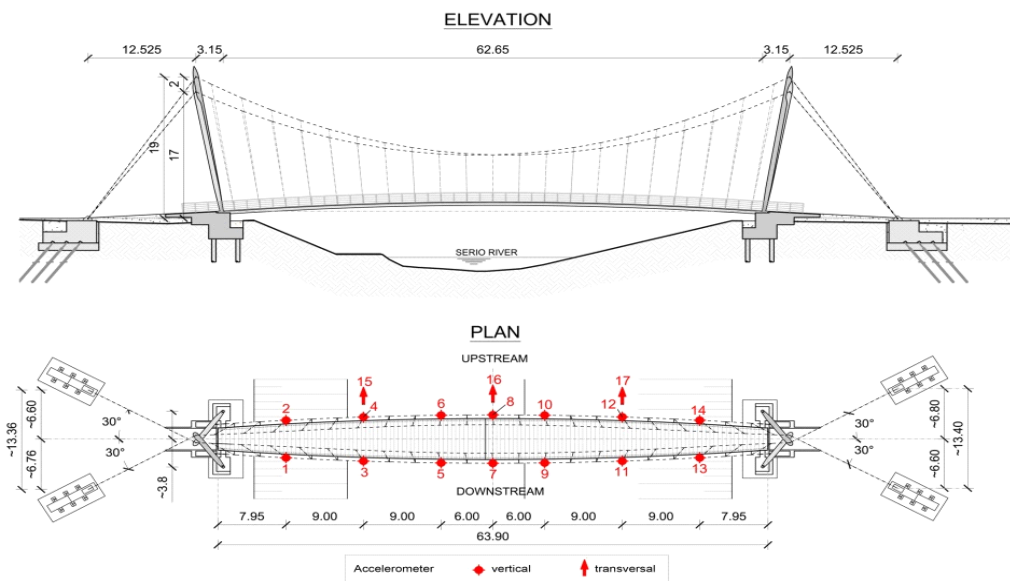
Elevation and plan of the footbridge (dimensions in m). Sensors layout during the field tests.
